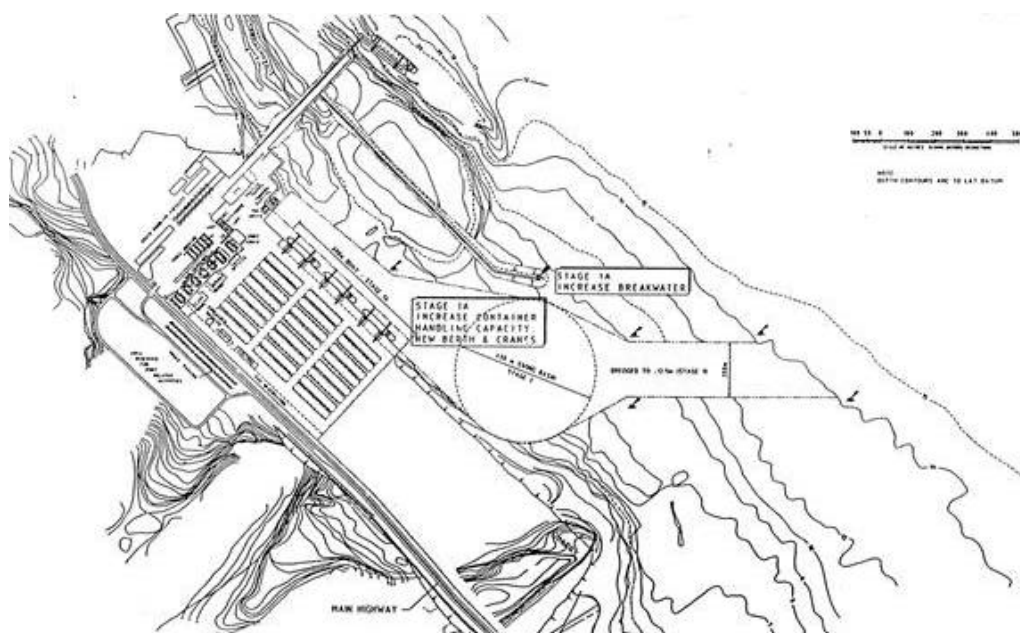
F-1 Original Plan of Bojonegara Development (Stage-1)
